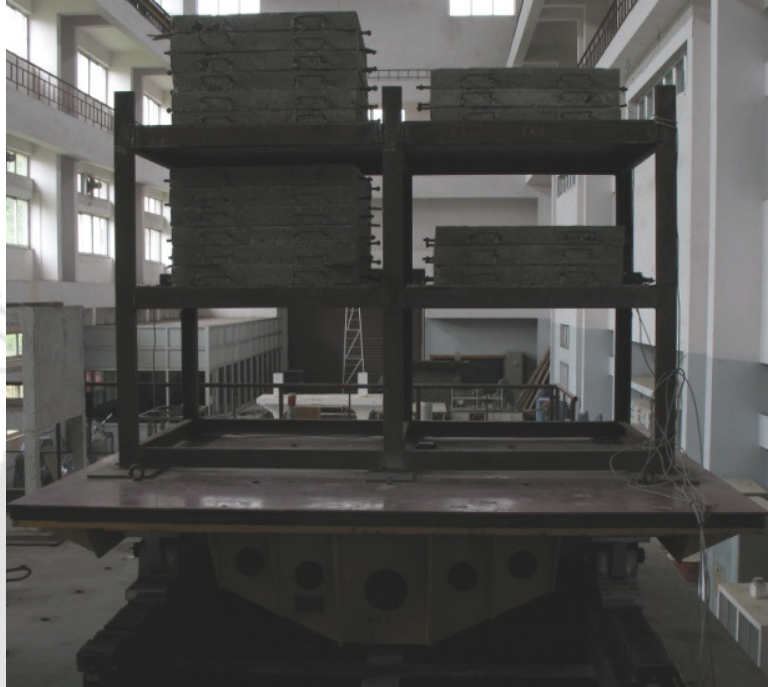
Scaled steel laboratory test model with additional floor mass
